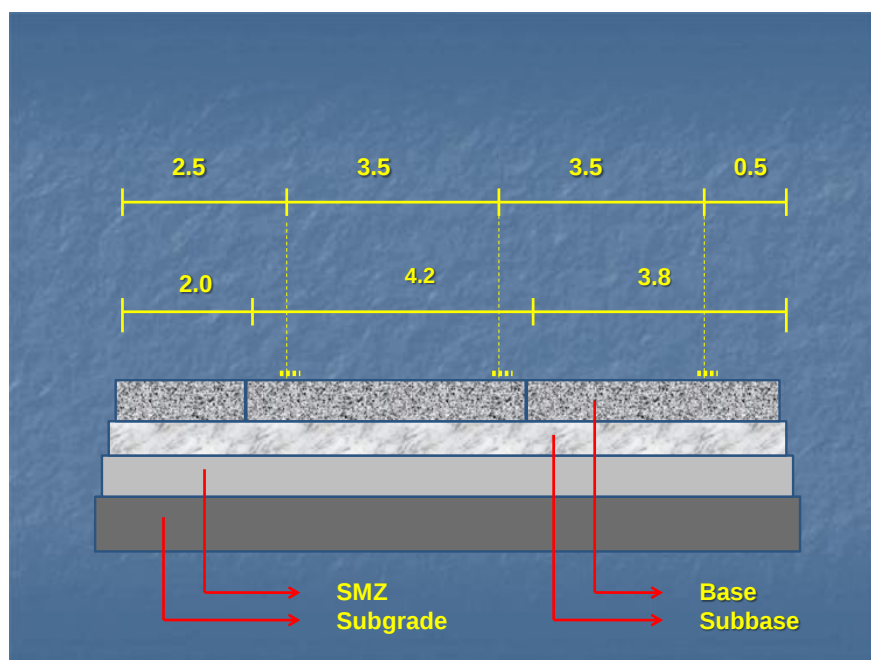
Typical two-lane carriageway cross section showing concrete shoulder, lanemarking and longitudinal joint locations. Drainage not shown
